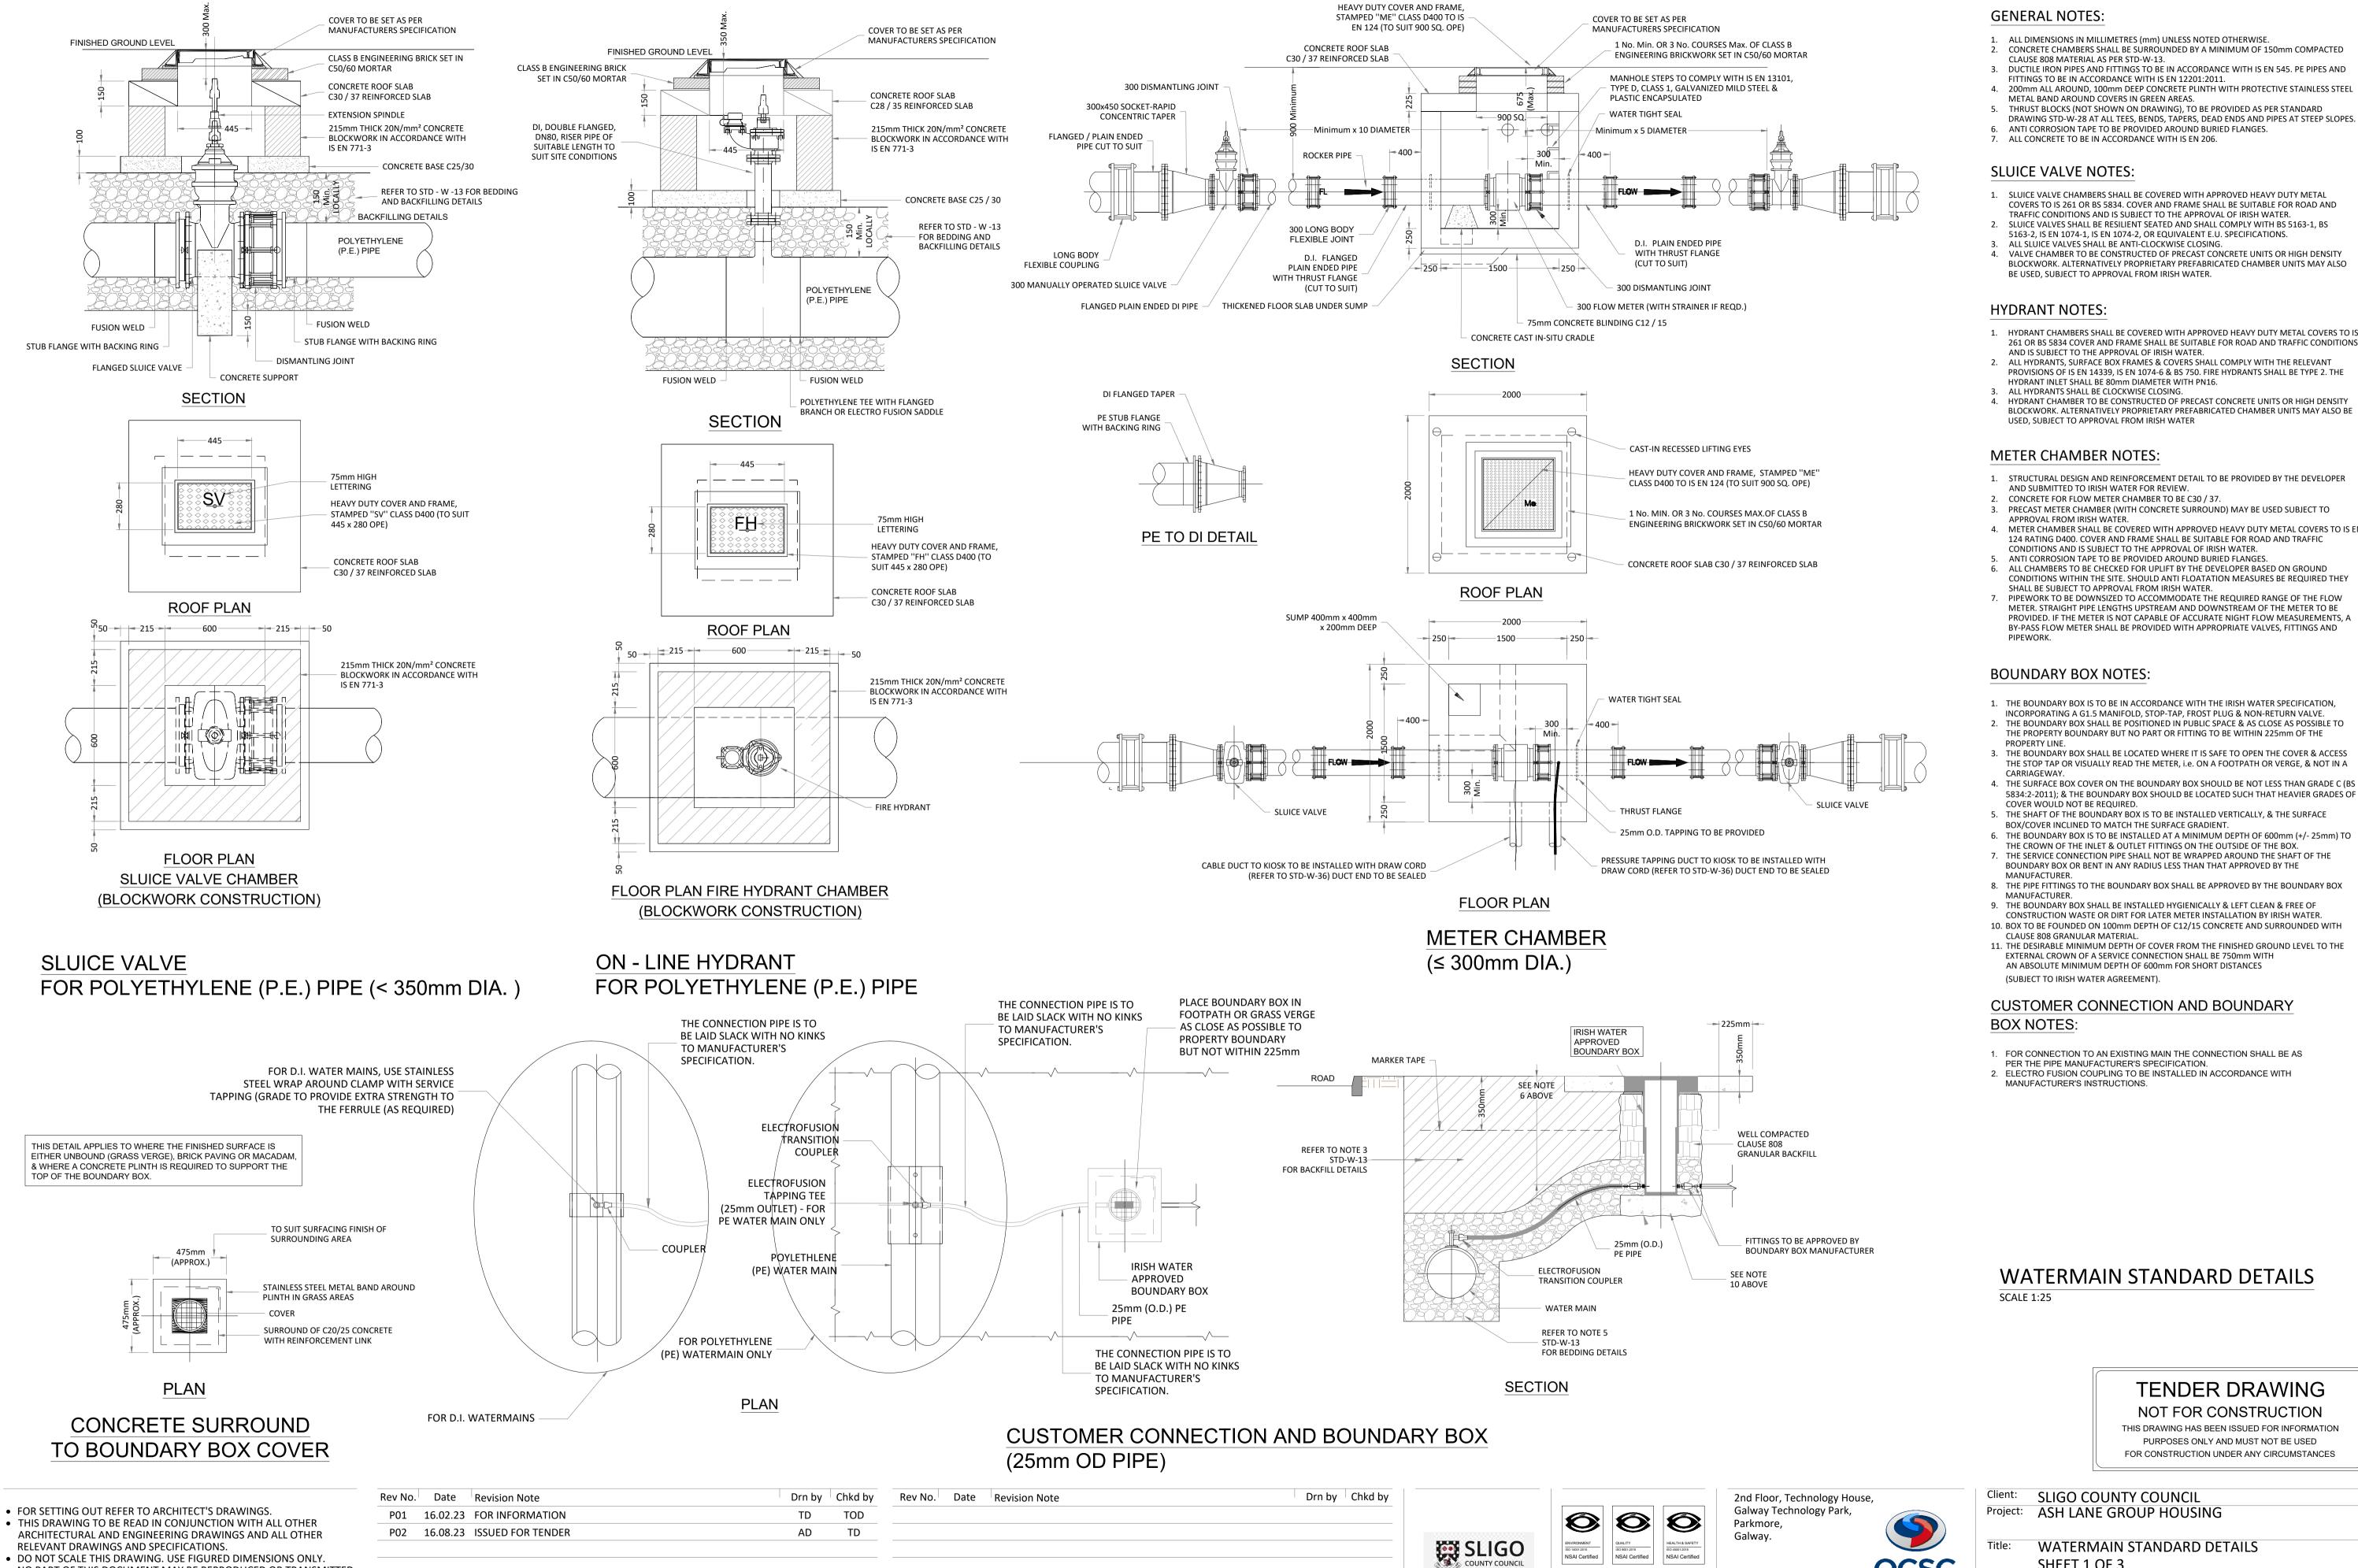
DETAIL 'A' EXTRACT FROM IRISH WATER STANDARD DETAIL STD-W-11
